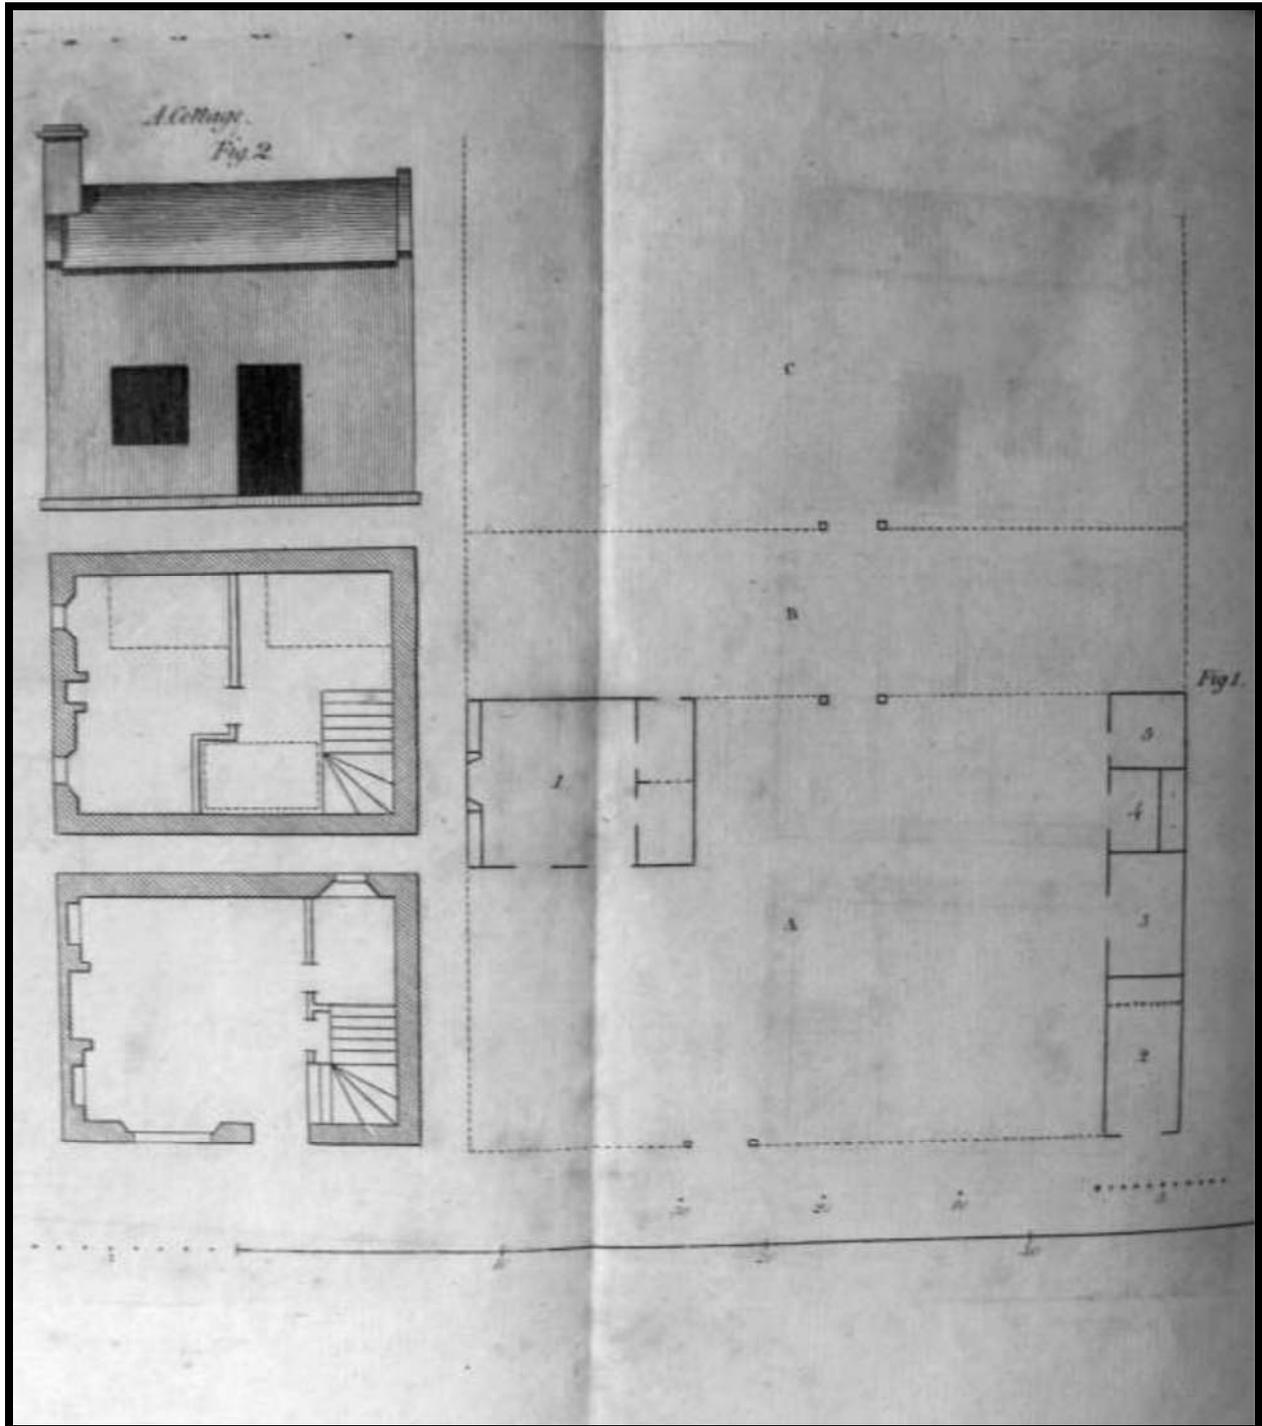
J. B. Bordley's plan of a cottage and garden for agricultural laborers. On the right, note the plan of a cottage (1), front yard (A), backyard (B), garden (C), and outbuildings (2-5). Figure 2 on the left shows the front elevation and the first and second floor plans (Source: Bordley 1801).
